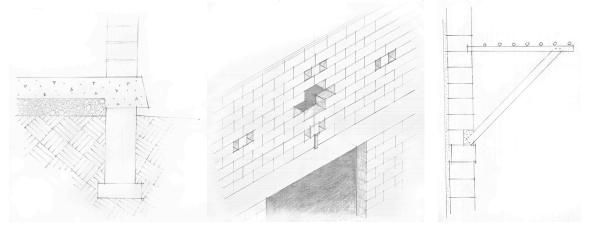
Foundation condition for prevention of termite infestation; Figure 5b: omission of masonry units to allow for ventilation; and Figure 5c: One shading device design proposing use of local reed plant
